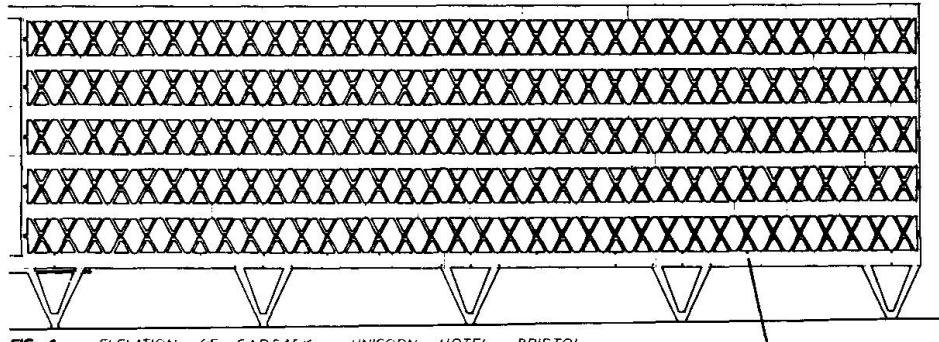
ELEVATION OF CARFARK - UNICORN HOTEL, BRISTOL
